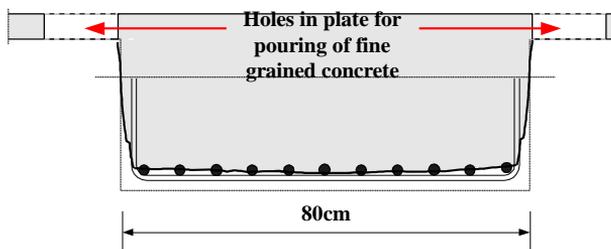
and 18. Removal of the damaged concrete cover and drilling a slab opening
